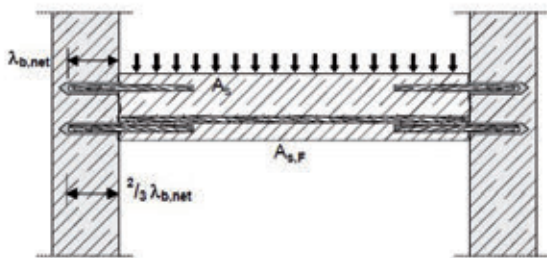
End anchoring of slabs or beams, designed as simply supported
